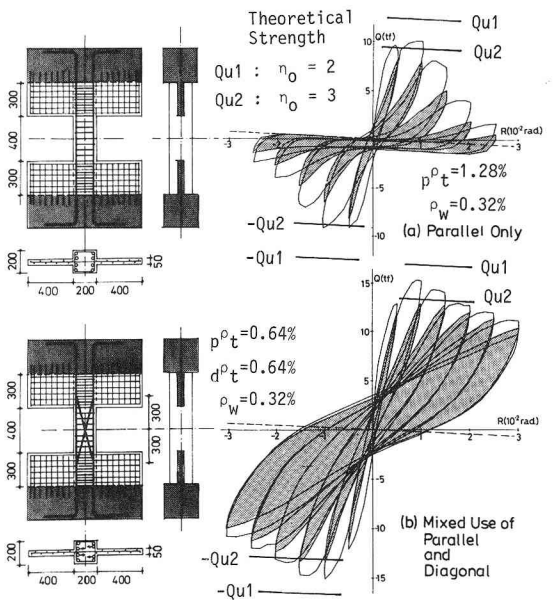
Application of Diagonal Reinforcement to Short Columns with Spandrel Beams
